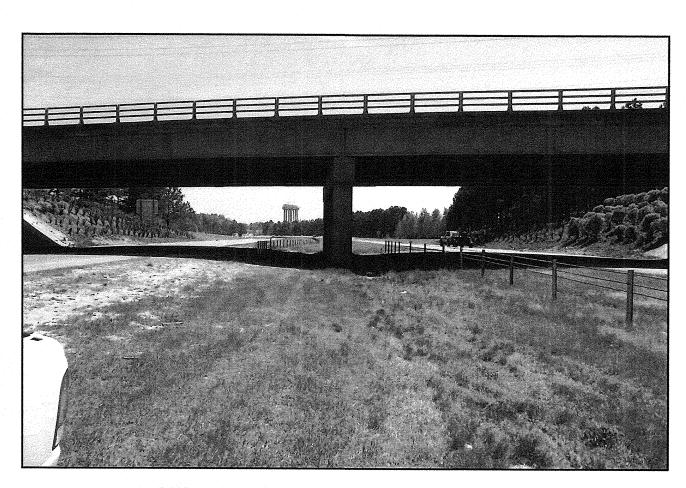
BENT 1, LOOKING SOUTH TOWARD BORING B1A
